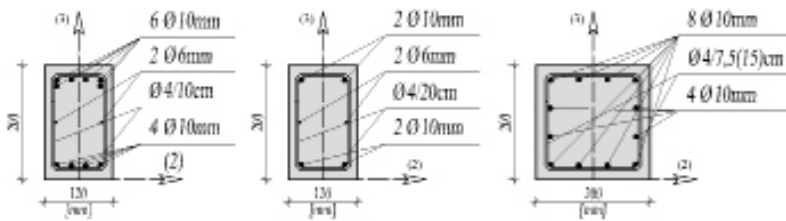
Selected dimensions, cross sections and reinforcement of the frame building members, columns (1–1) and beams (2–2 and 3–3)
